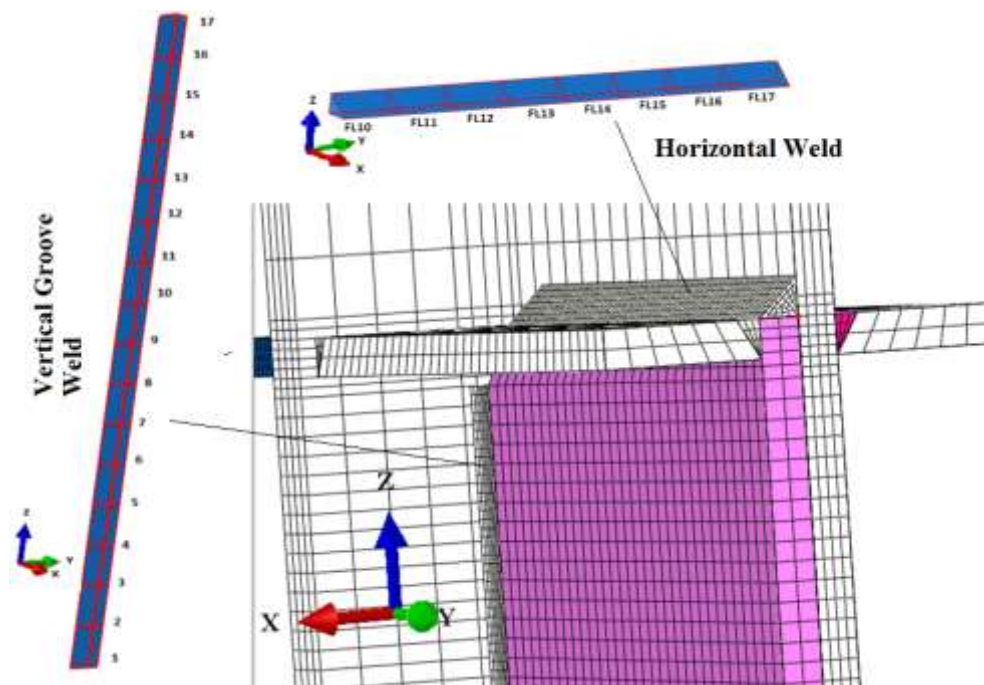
Horizontal weld and groove weld attaching DP
